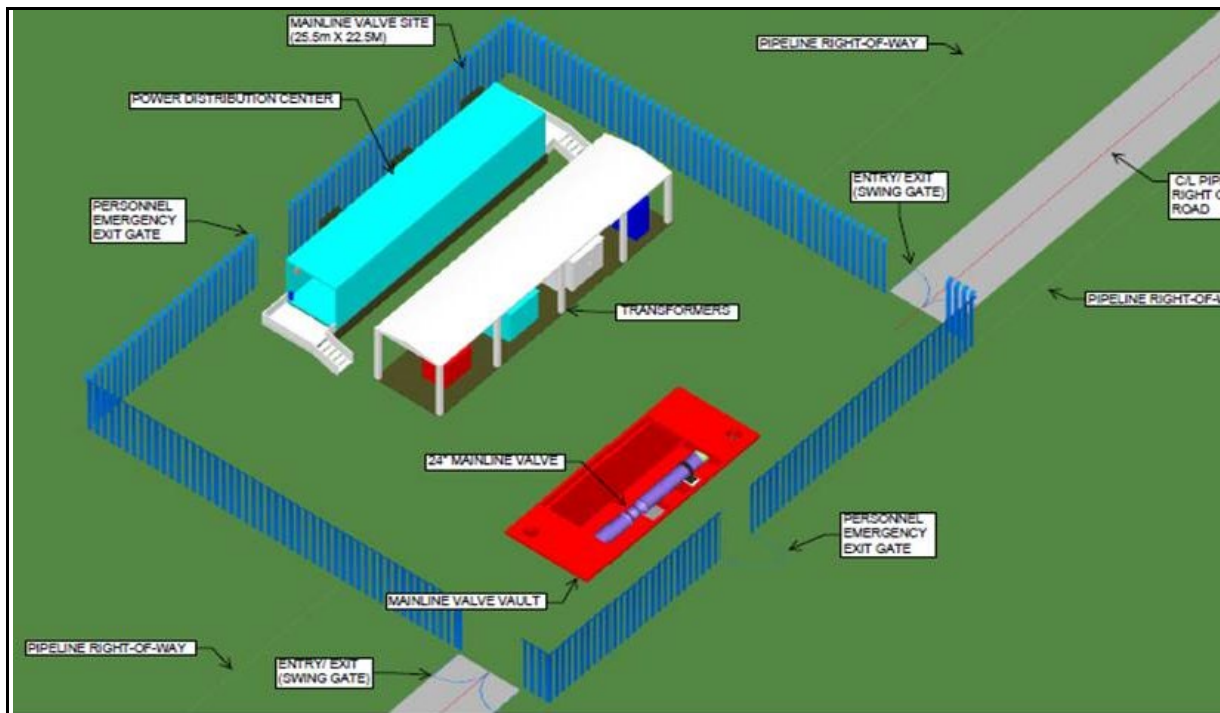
Typical Electric Substation with Main Line Block Valve Station
